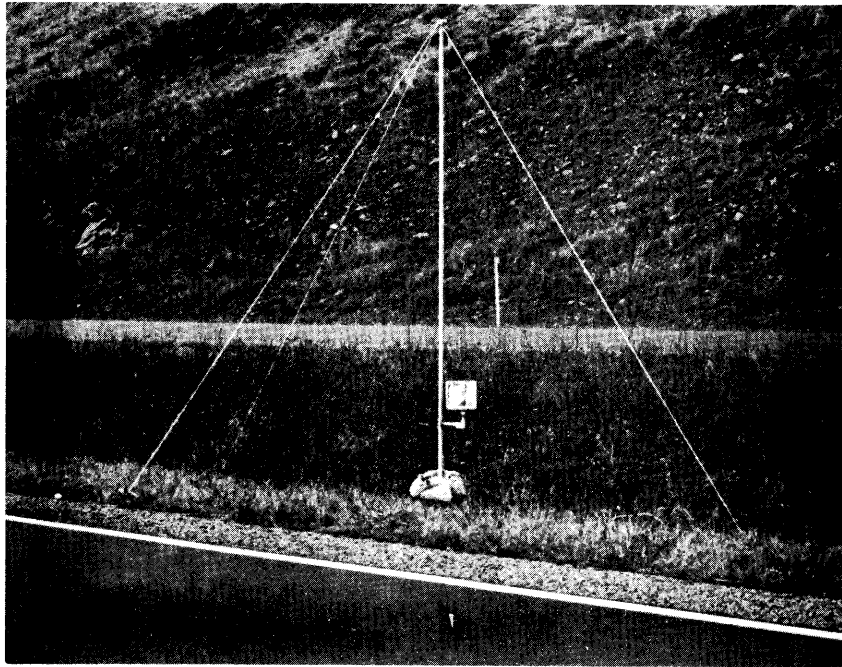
Low level light mounted by specially designed arm onto assembly consisting of 12-ft. (365.8 cm) pipe welded to automobile wheel, guy wires, and sand bags.
